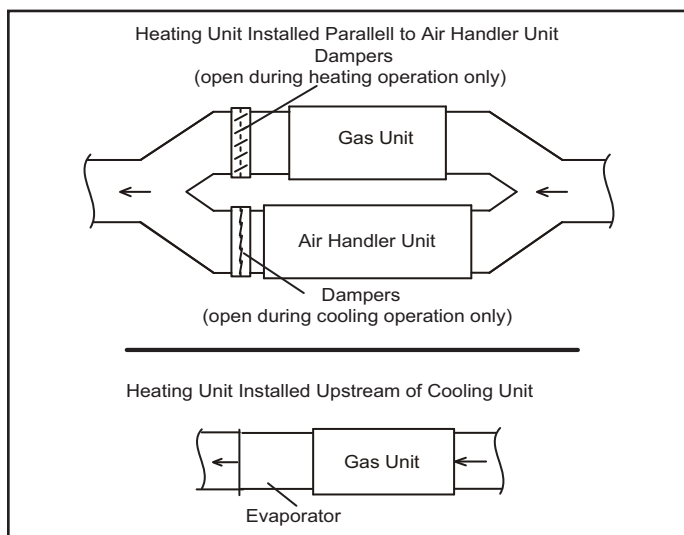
Heating Unit Installed Parallel to Air Handler Unit
